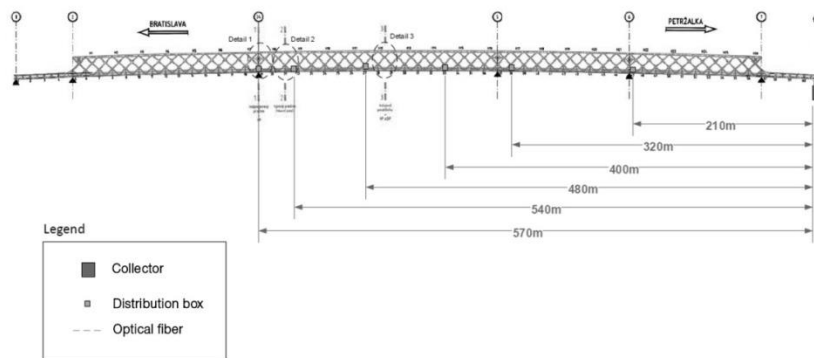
Schematic view of the bridge with highlighted locations of collector joints.
